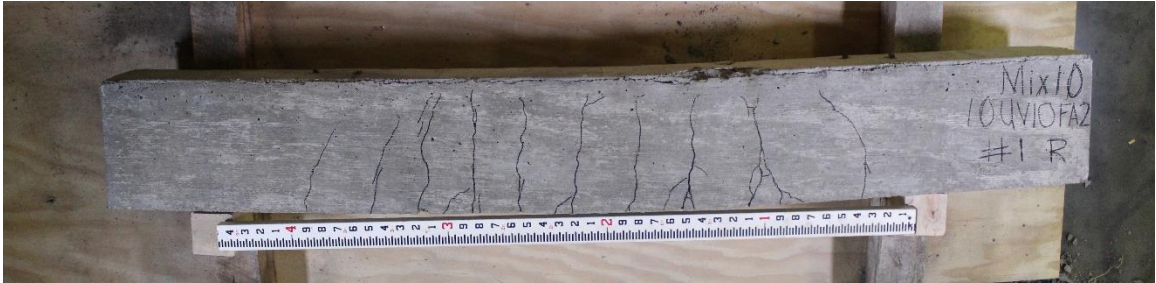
Mixture 10 (10UV10FA2) beam #1R: concrete beam side view.
